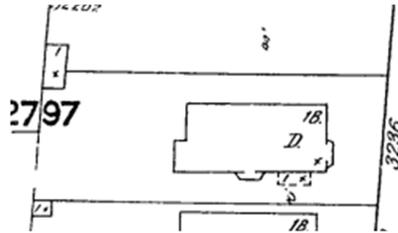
Site plans of 3236 King Street in 1911. North is up.
